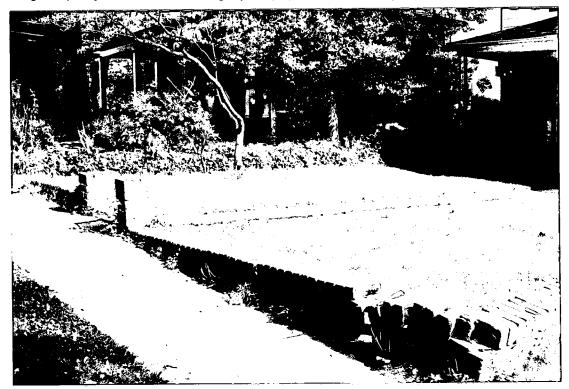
Tulip Ave: BRYCK WALL ON FRONT OF HOUSE
